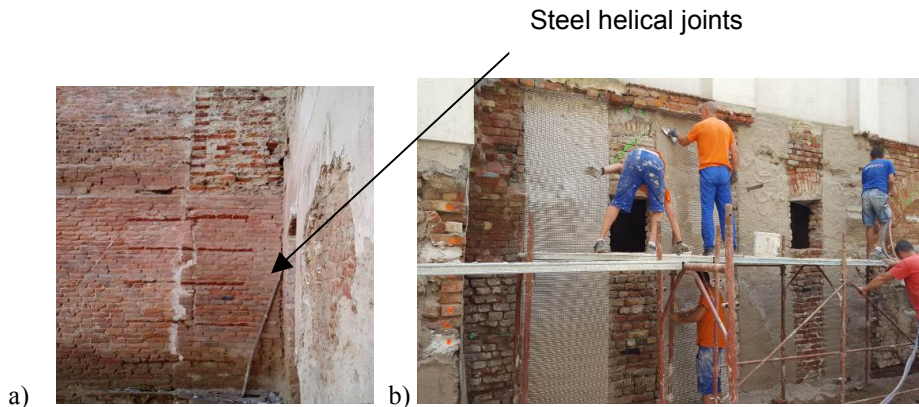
Consolidation of exterior walls: a) application of the steel helical joints, b) application of the reinforcement grid Kerakoll Rinforzo ARV 100 on the exterior walls
